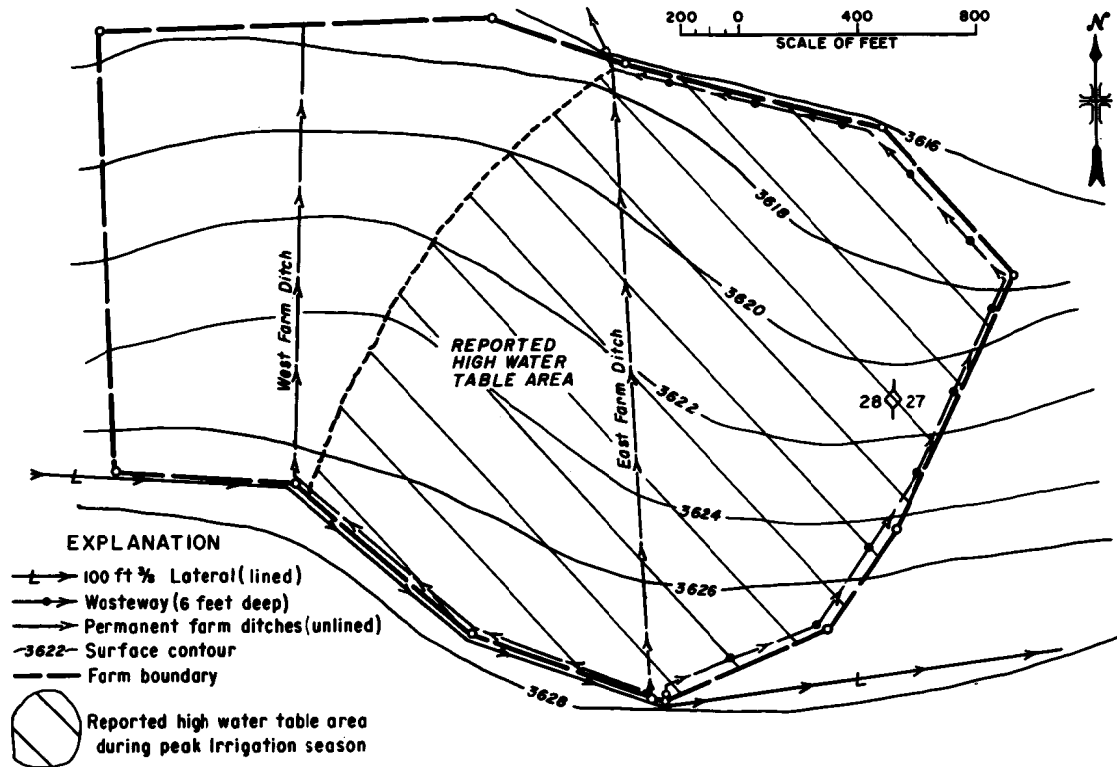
Layout, surface topography, and irrigation facilities of the sample farm. Drawing 103-D-670.
